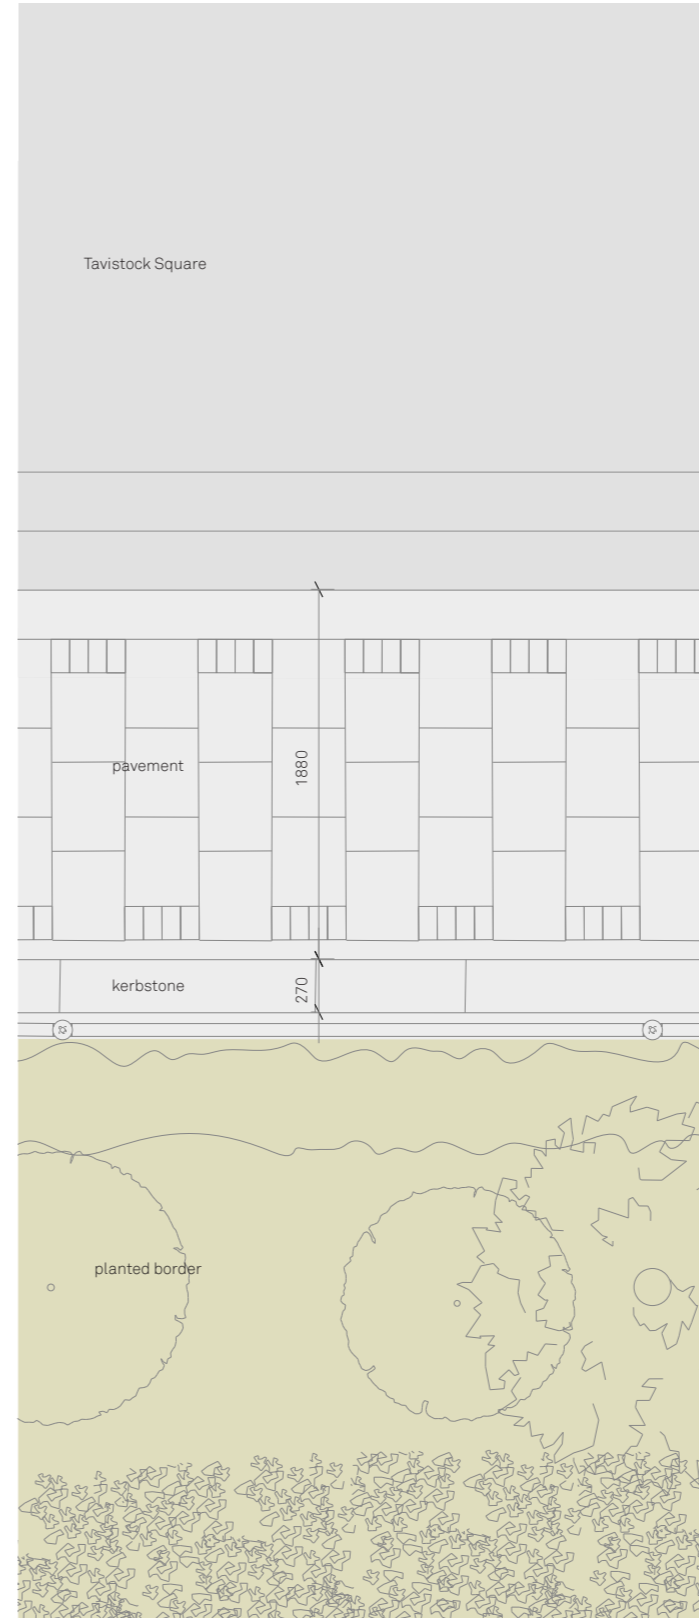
Existing plan of railings and pavement in proposed memorial location
